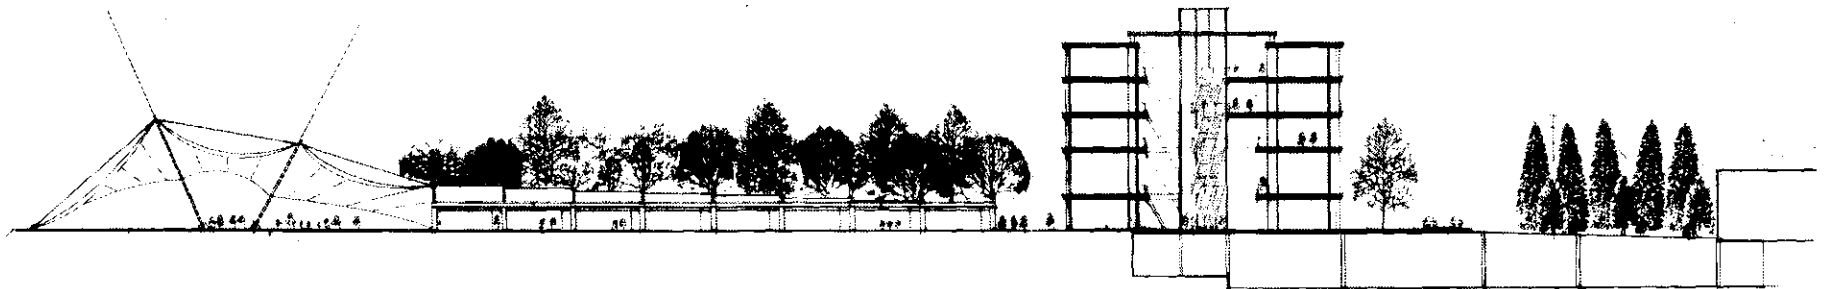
Site Section Through Vertical Circulation 1:20
